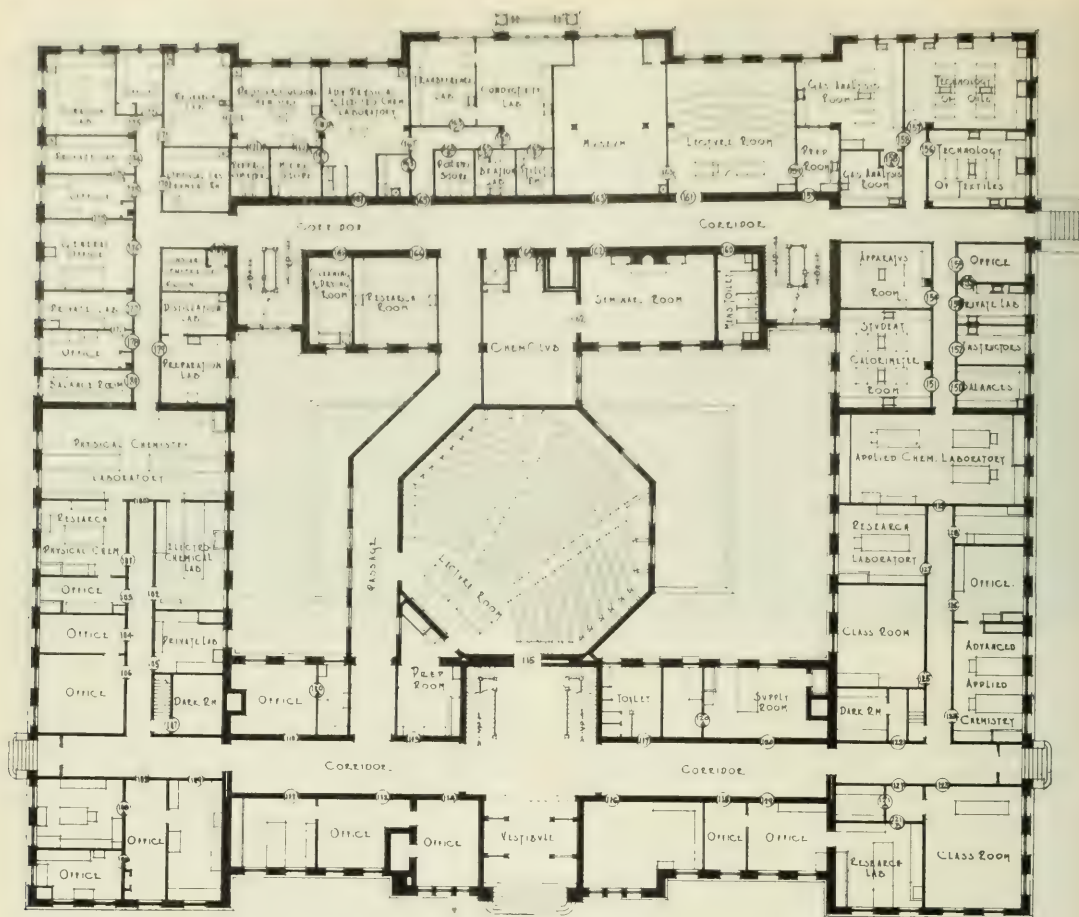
FIG. II.—PLAN OF FIRST FLOOR—CHEMISTRY BUILDING
